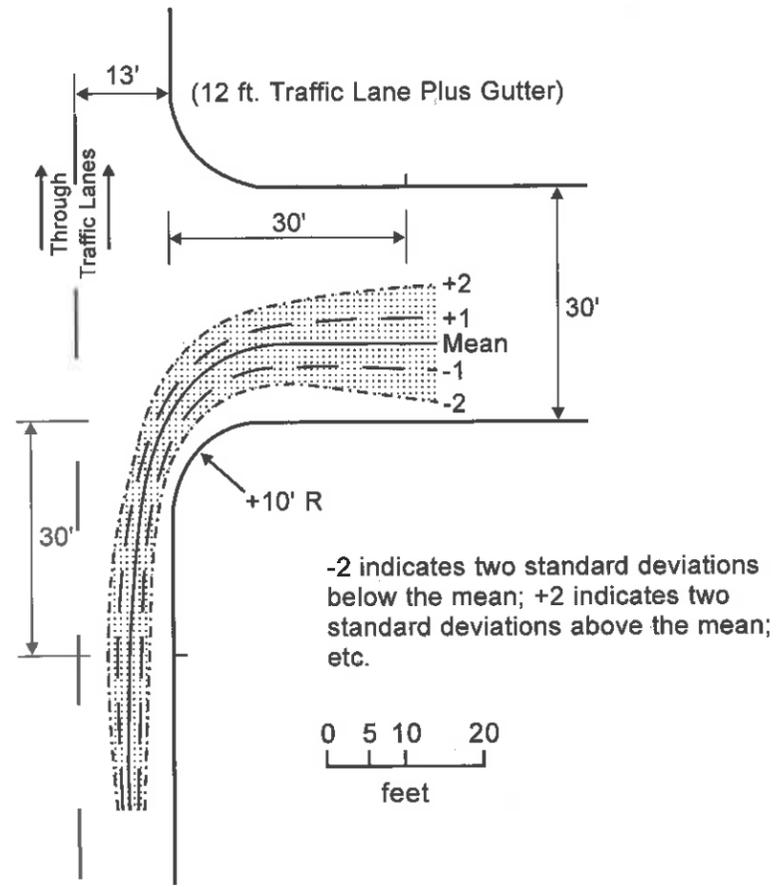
Observed Paths of Right-Front Wheel of Passenger Cars on Right-Turn Entry Maneuver
